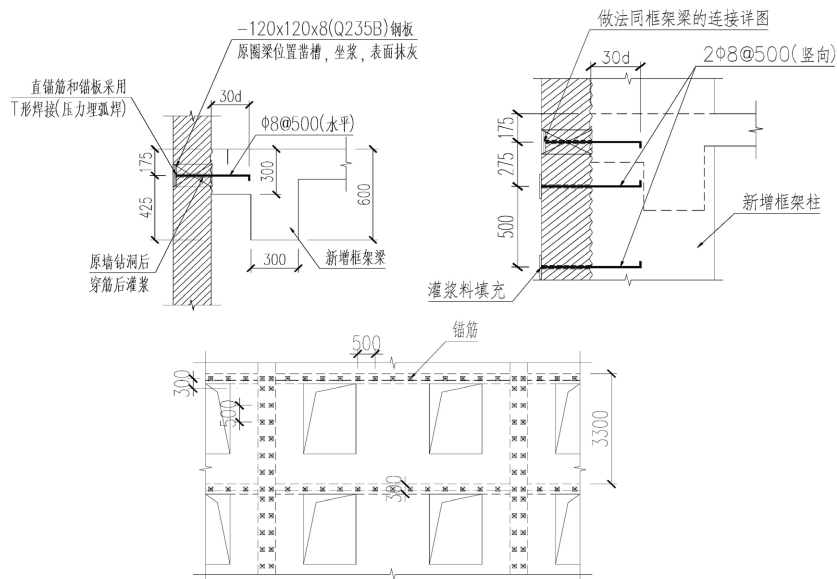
Connection details of existing masonry wall and new frame beam column and elevation of anchor bars
